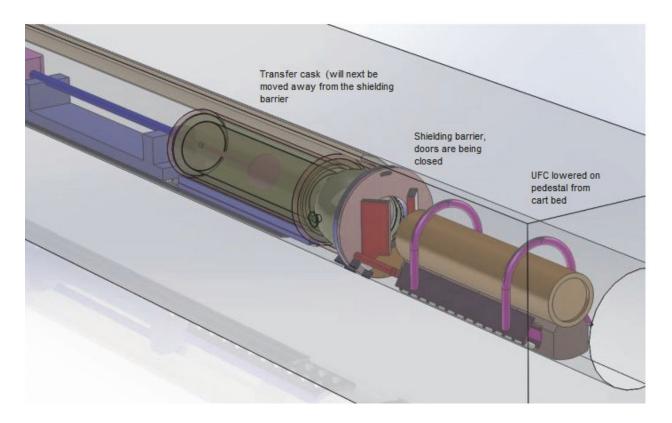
UFC Placed on Pedestal with Shielding Barrier Doors Closing
